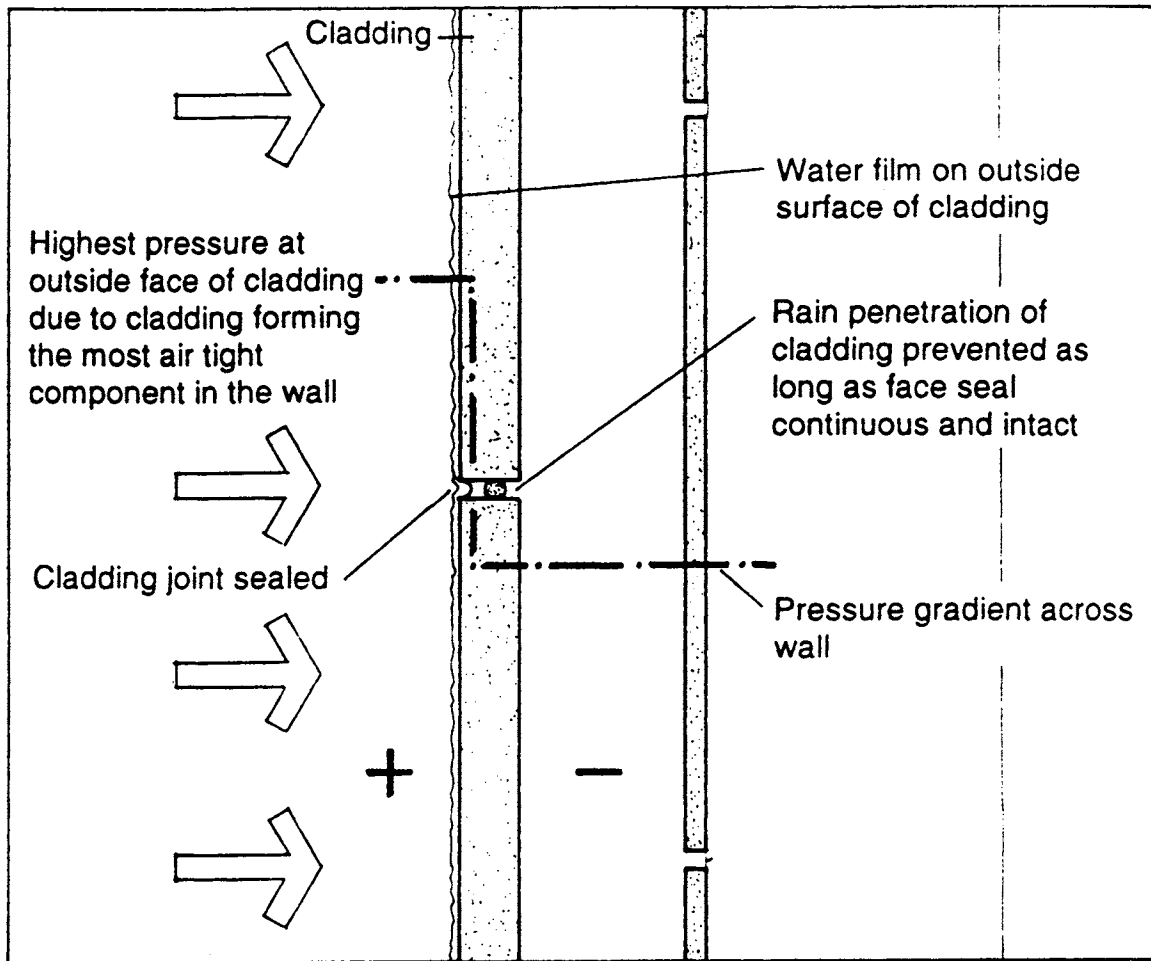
FACE SEALED SINGLE ELEMENT WALL
